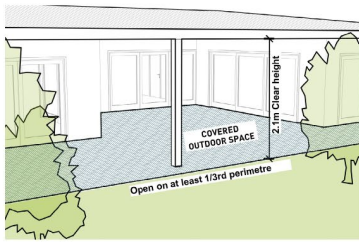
Covered areas such as verandahs can be included in outdoor space calculations.
